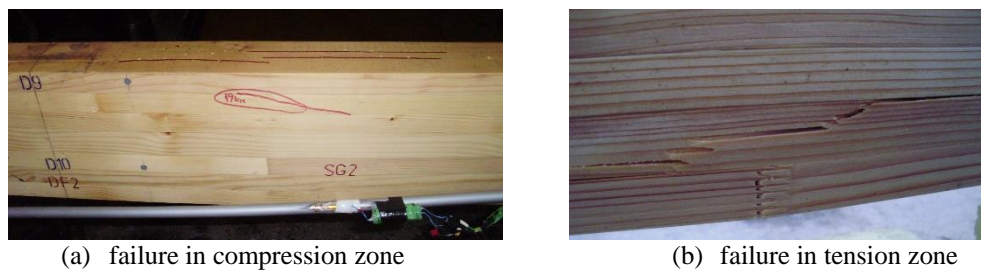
By prestressing the contrived order of failure of hybrid girder’s cross-section is a compression – tension
